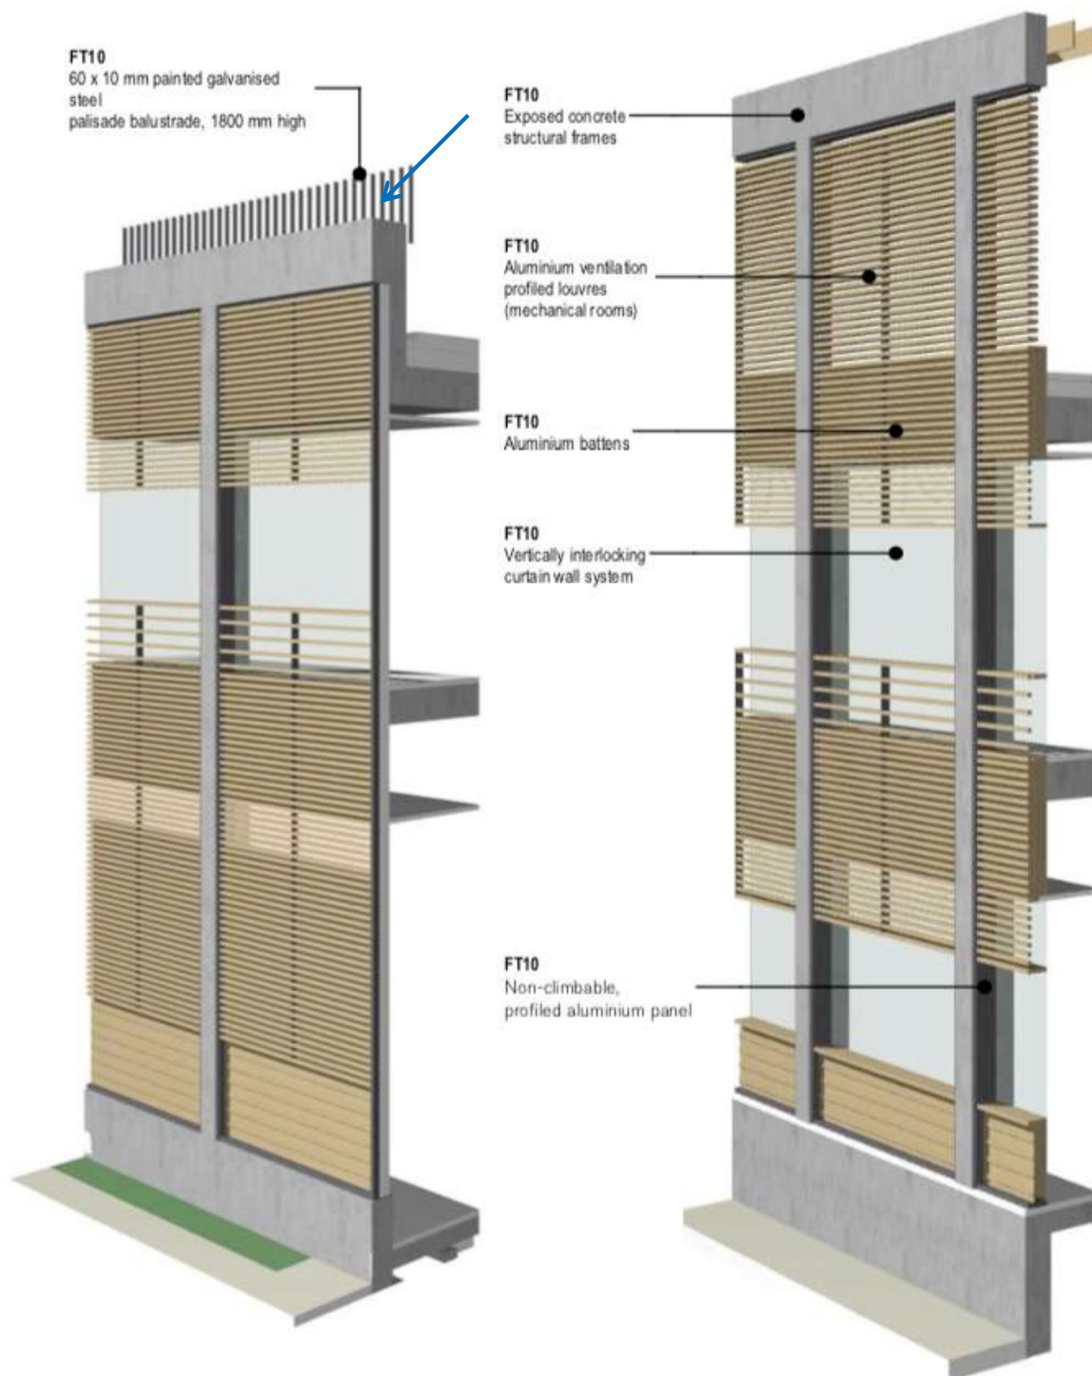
The SSD HIS, with the Safety Protection Structures indicated in blue arrow (Building J/H Façade Type Extent – Exposed concrete structure with metal and aluminium detailing (Source: FJMT, DA-5908, 18.12.19).
